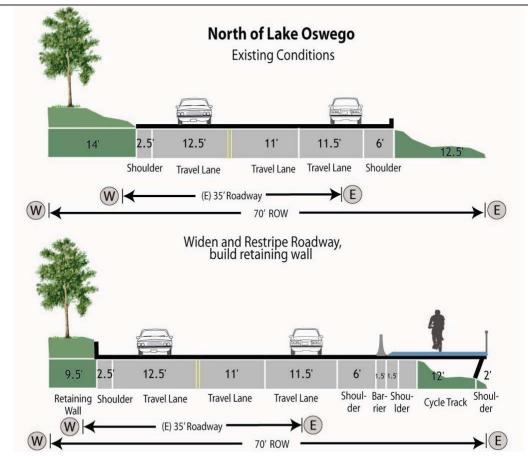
Conceptual Section 2.4b6- Widen Roadway 5' (W), add Retaining Wall, Bench Cycle Track onto Roadway and Restripe for 596'
